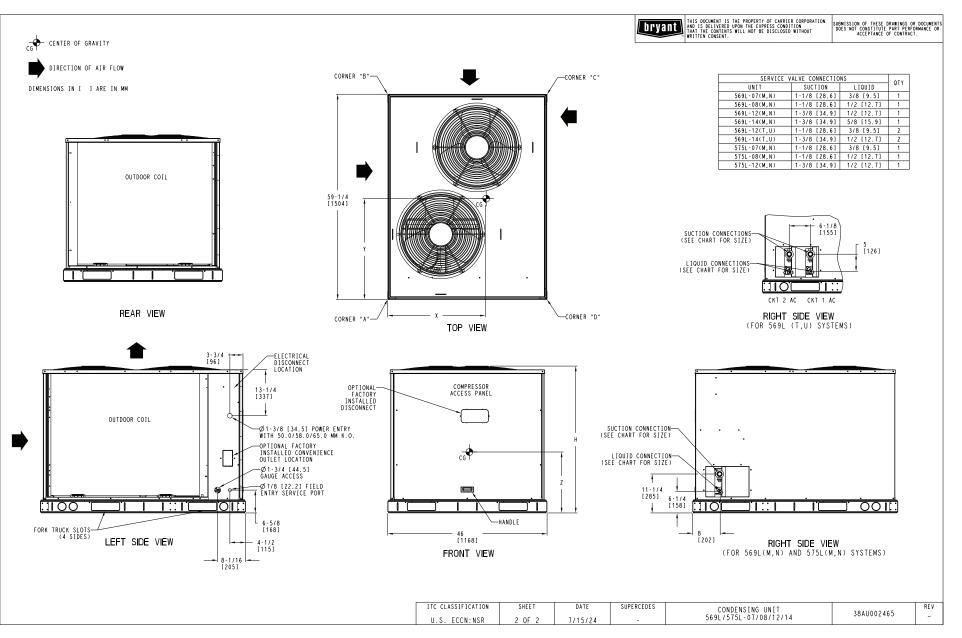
569L\*07-14 Base Unit Dimensions
